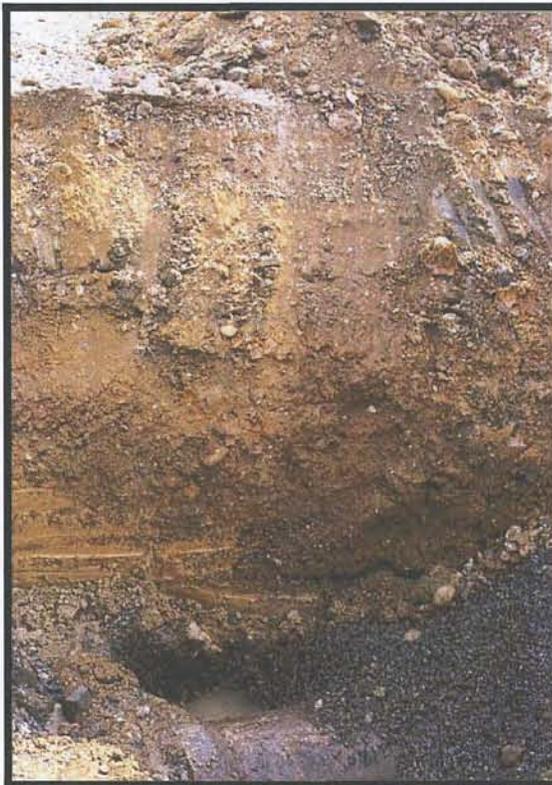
Block 4, Trench 3: Profile of east wall at 400 ft north, showing unconsolidated fill deposit and terra cotta drain pipe and water seepage
